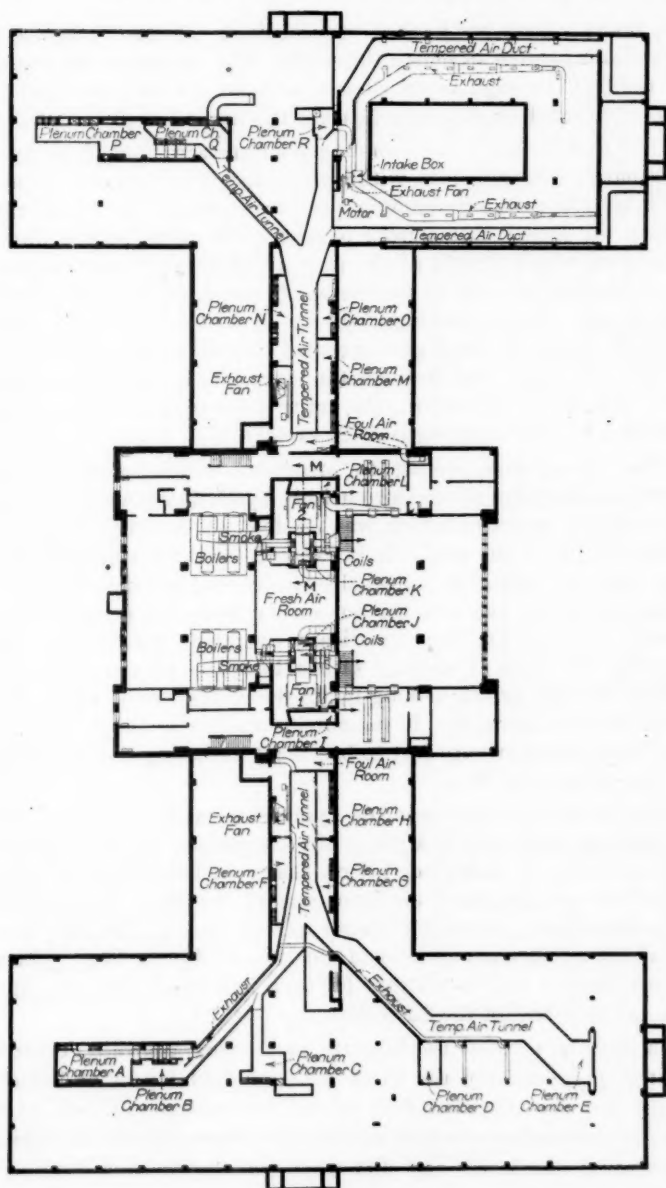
BASEMENT PLAN OF THE SCHOOL, SHOWING ARRANGEMENT OF HEATING PLANT, DUCTS AND PLENUM CHAMBERS.
